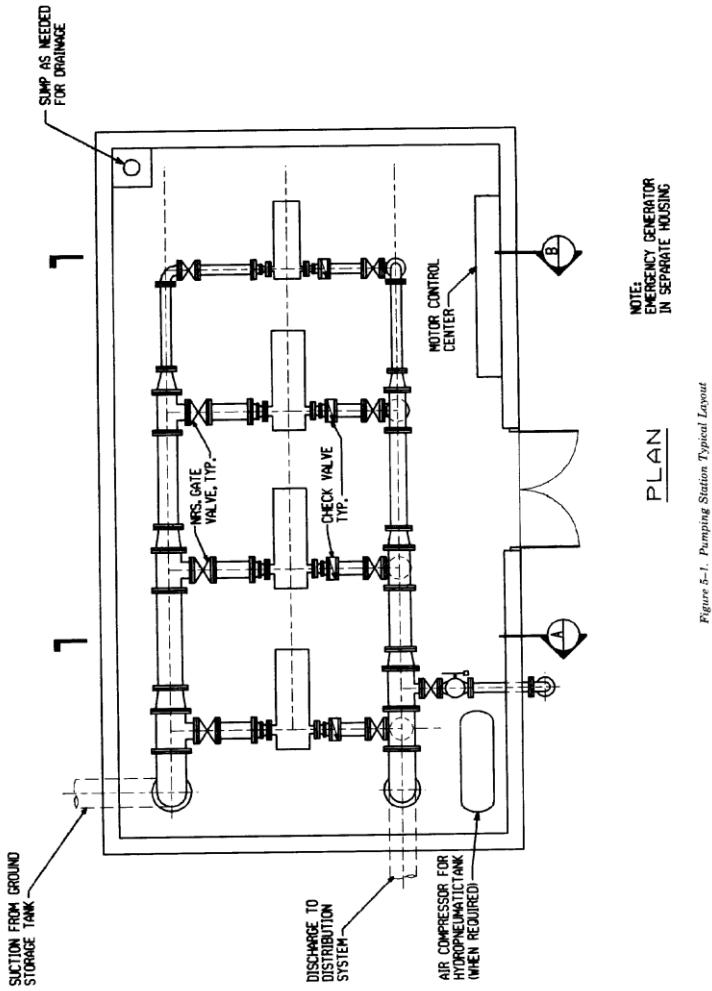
Typical Pumping Station, plan, US DEP. OF THE ARMY [5]
